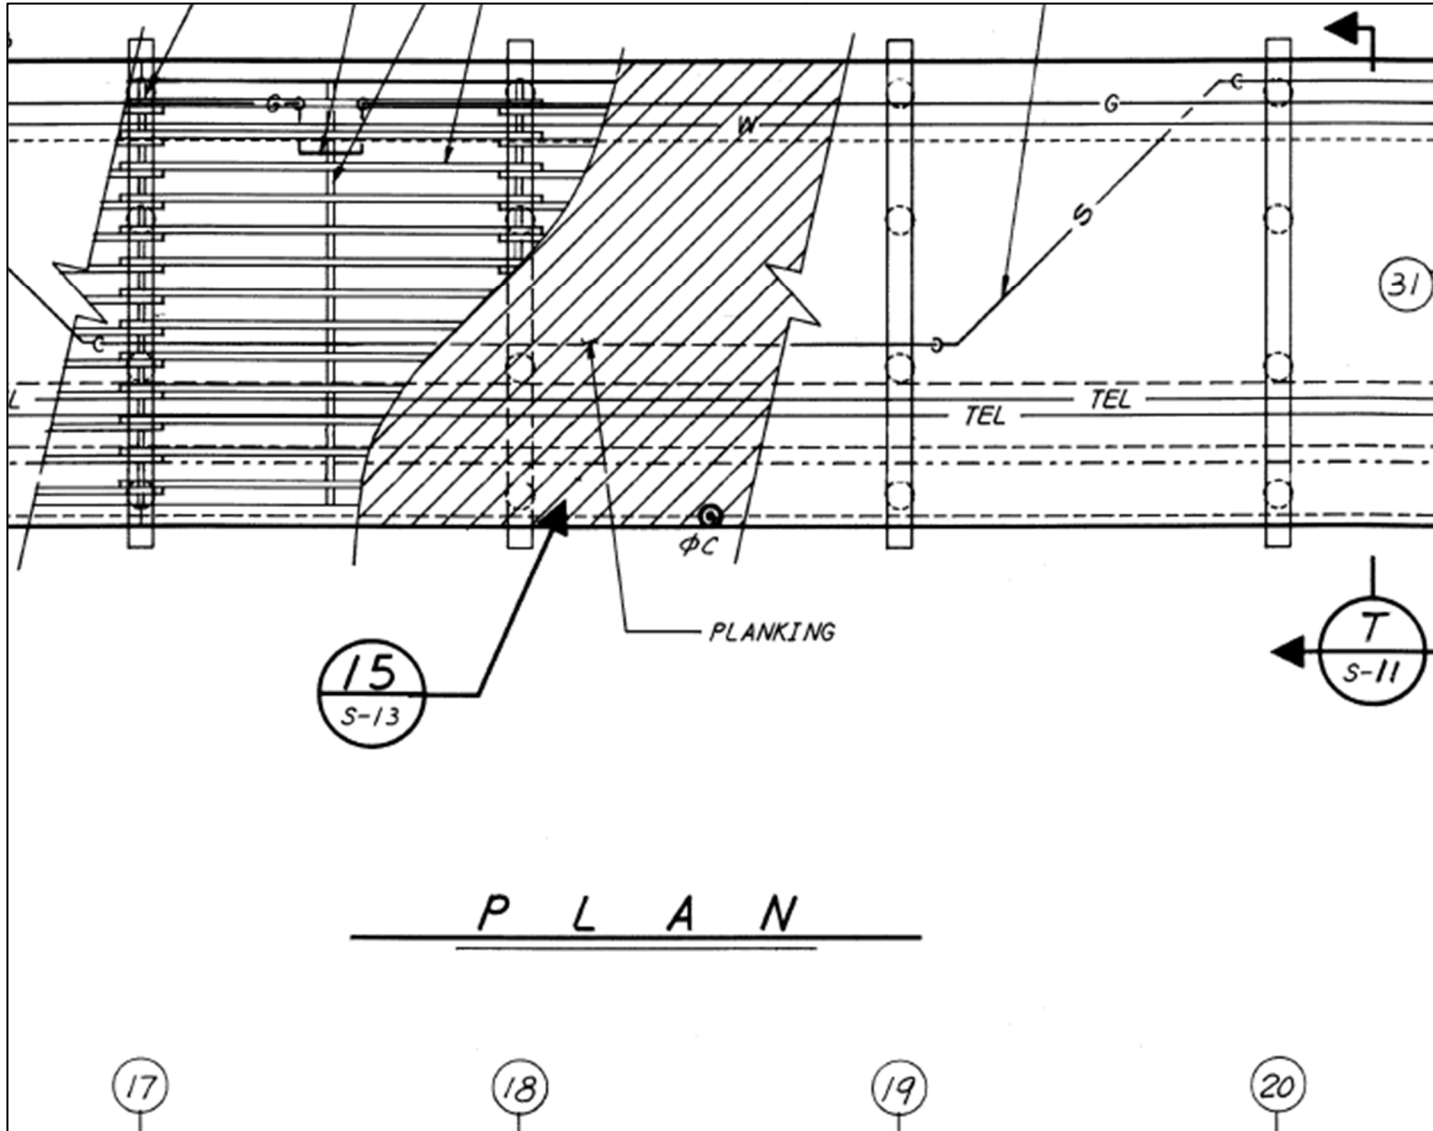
Typical Planking Plan, referencing detail 15/S-13 (see Figure A-4).
